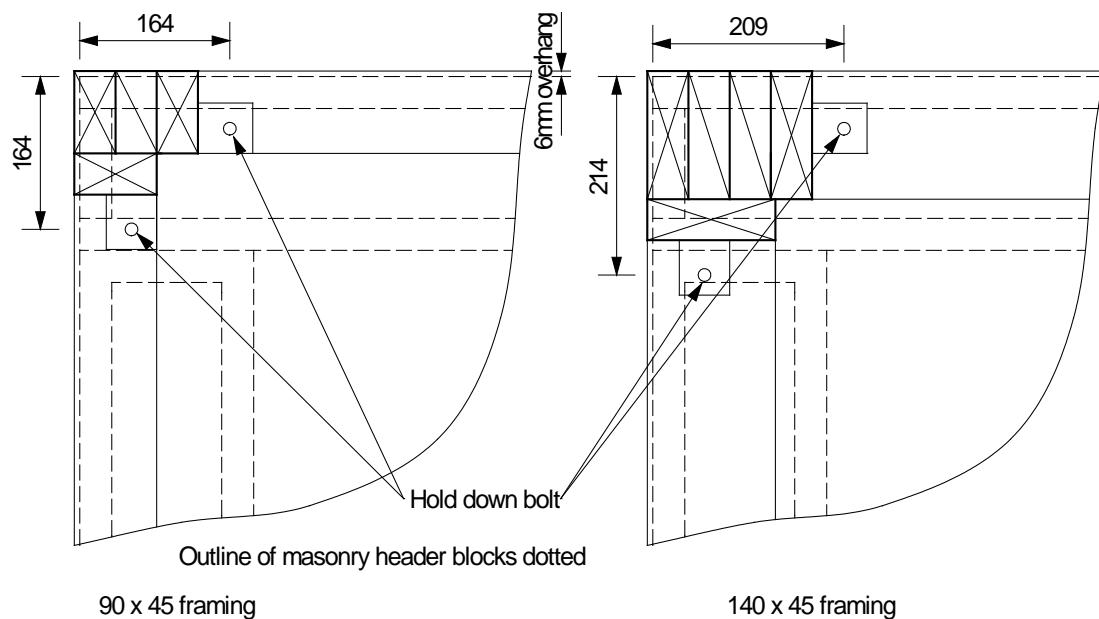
Layout of traditional wall framing at a foundation corner showing hold-down bolt locations.
